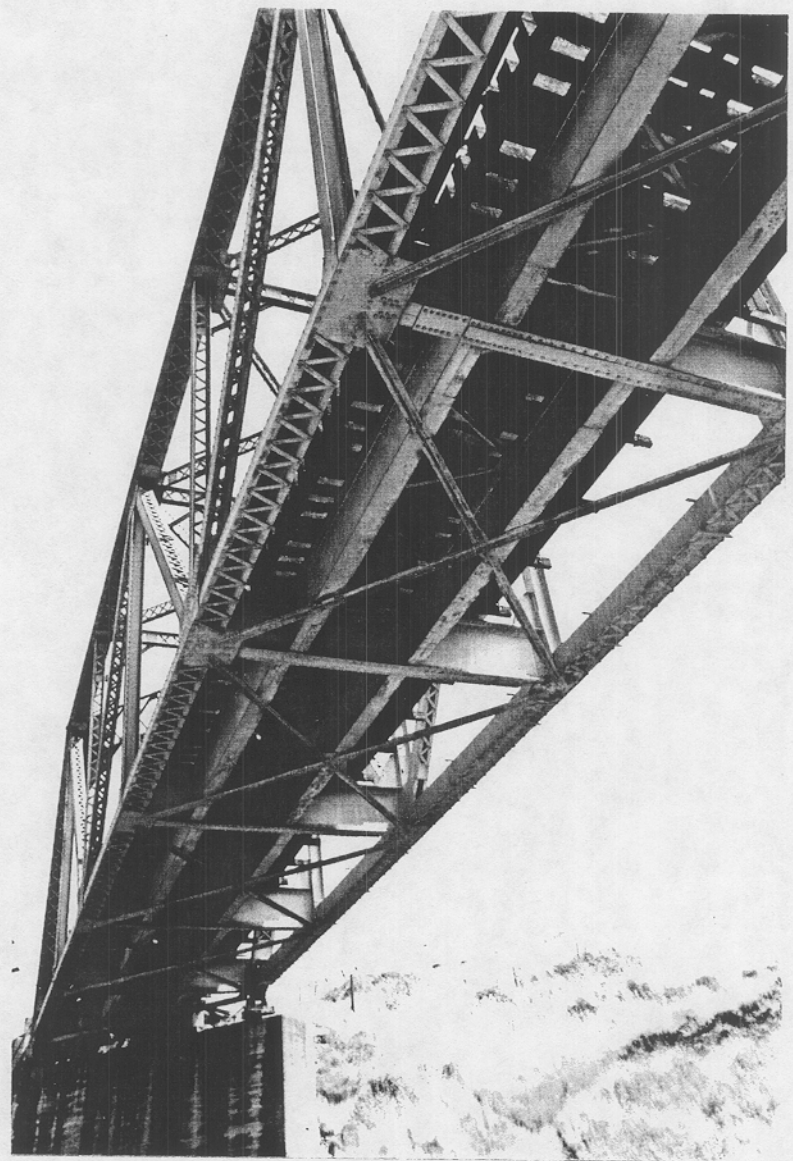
Altamont Pass Road Underpass Bridge (view of substructure)
